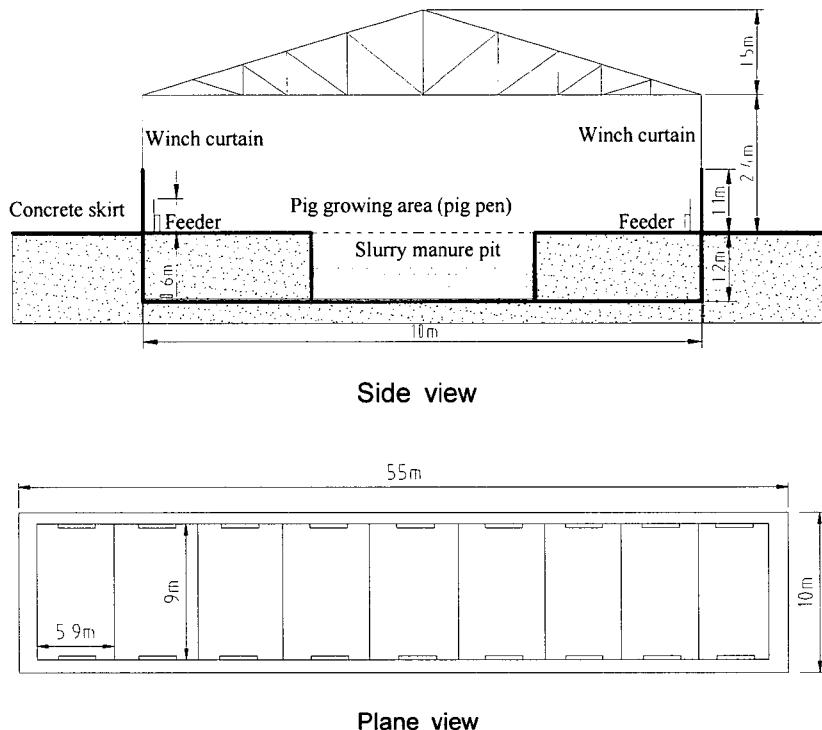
Side view and plane view of the growing-finishing pig house for odor gas measurement.
